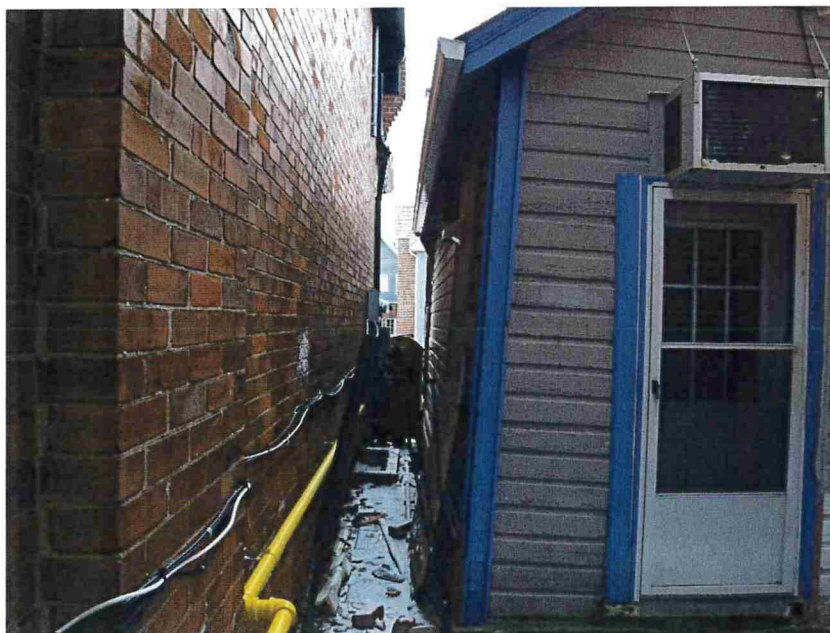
South sidewall (image distortion due to limited distance from which to take photograph)
